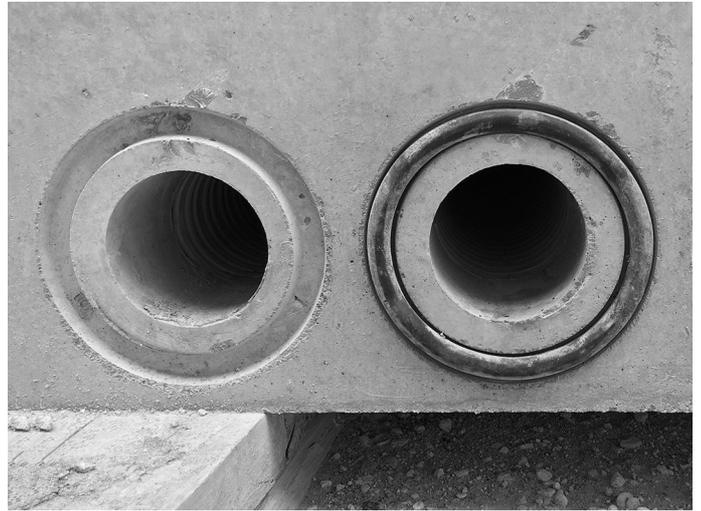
O-ring detail / Dettaglio dell'O-ring.
